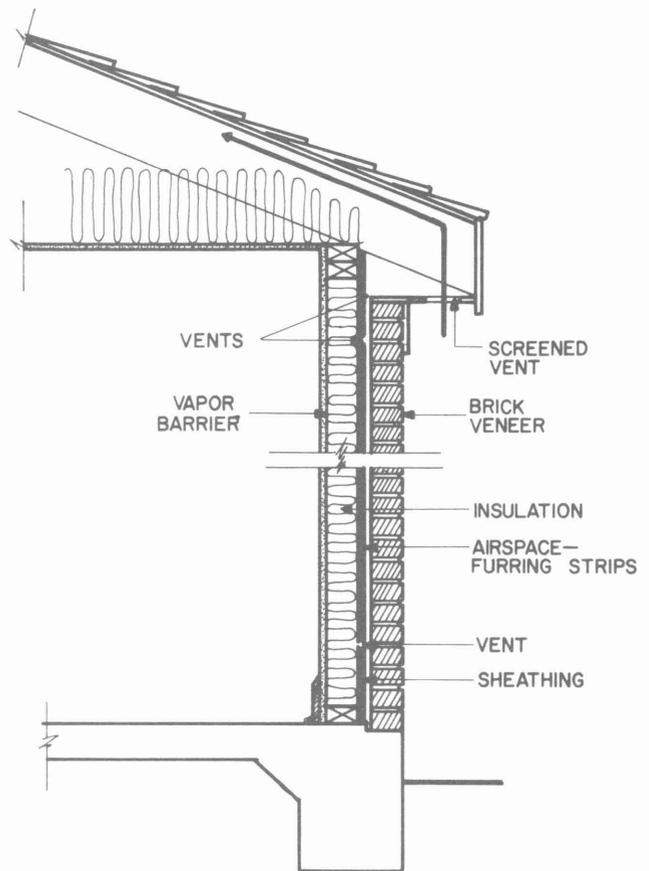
Ventilation of wall cavities for brick veneer construction. Presence of an excellent vapor barrier near the inside wall surface should eliminate the need for cavity ventilation.
